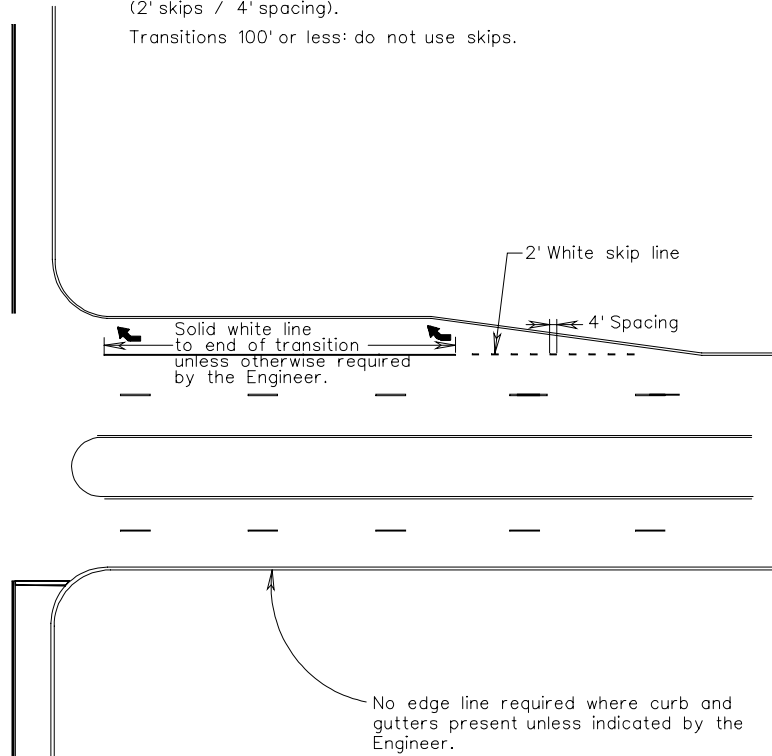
DETAIL FOR LOCATION OF EDGE LINES ON CURB SECTIONS OF ROADWAY (NO GUTTER)
